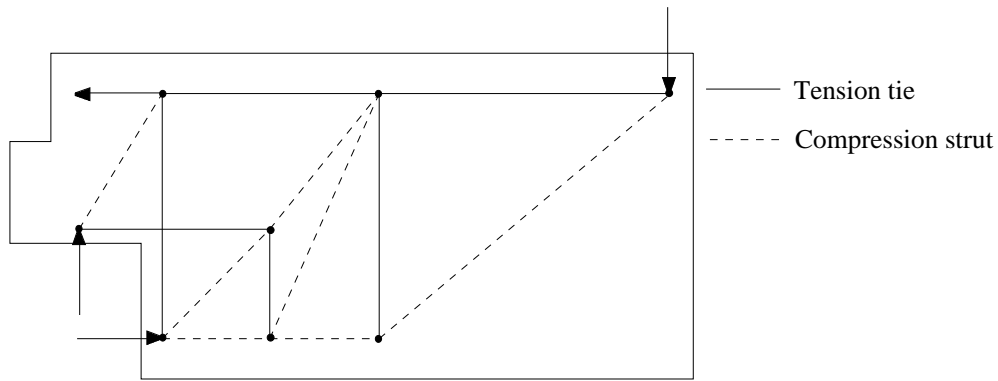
Strut-and-Tie Model for Beam of Specimen GJ-FR
